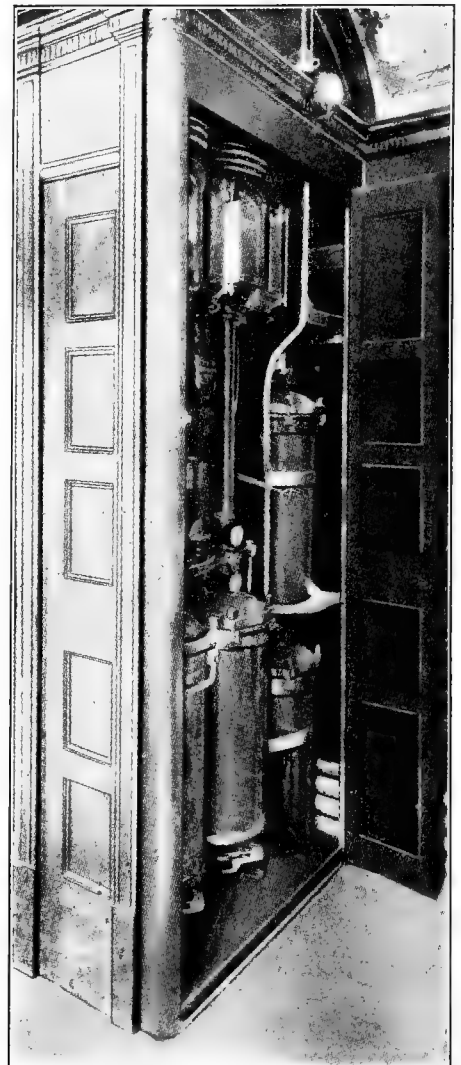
View Showing Location of Generator in Closet at End of Car
